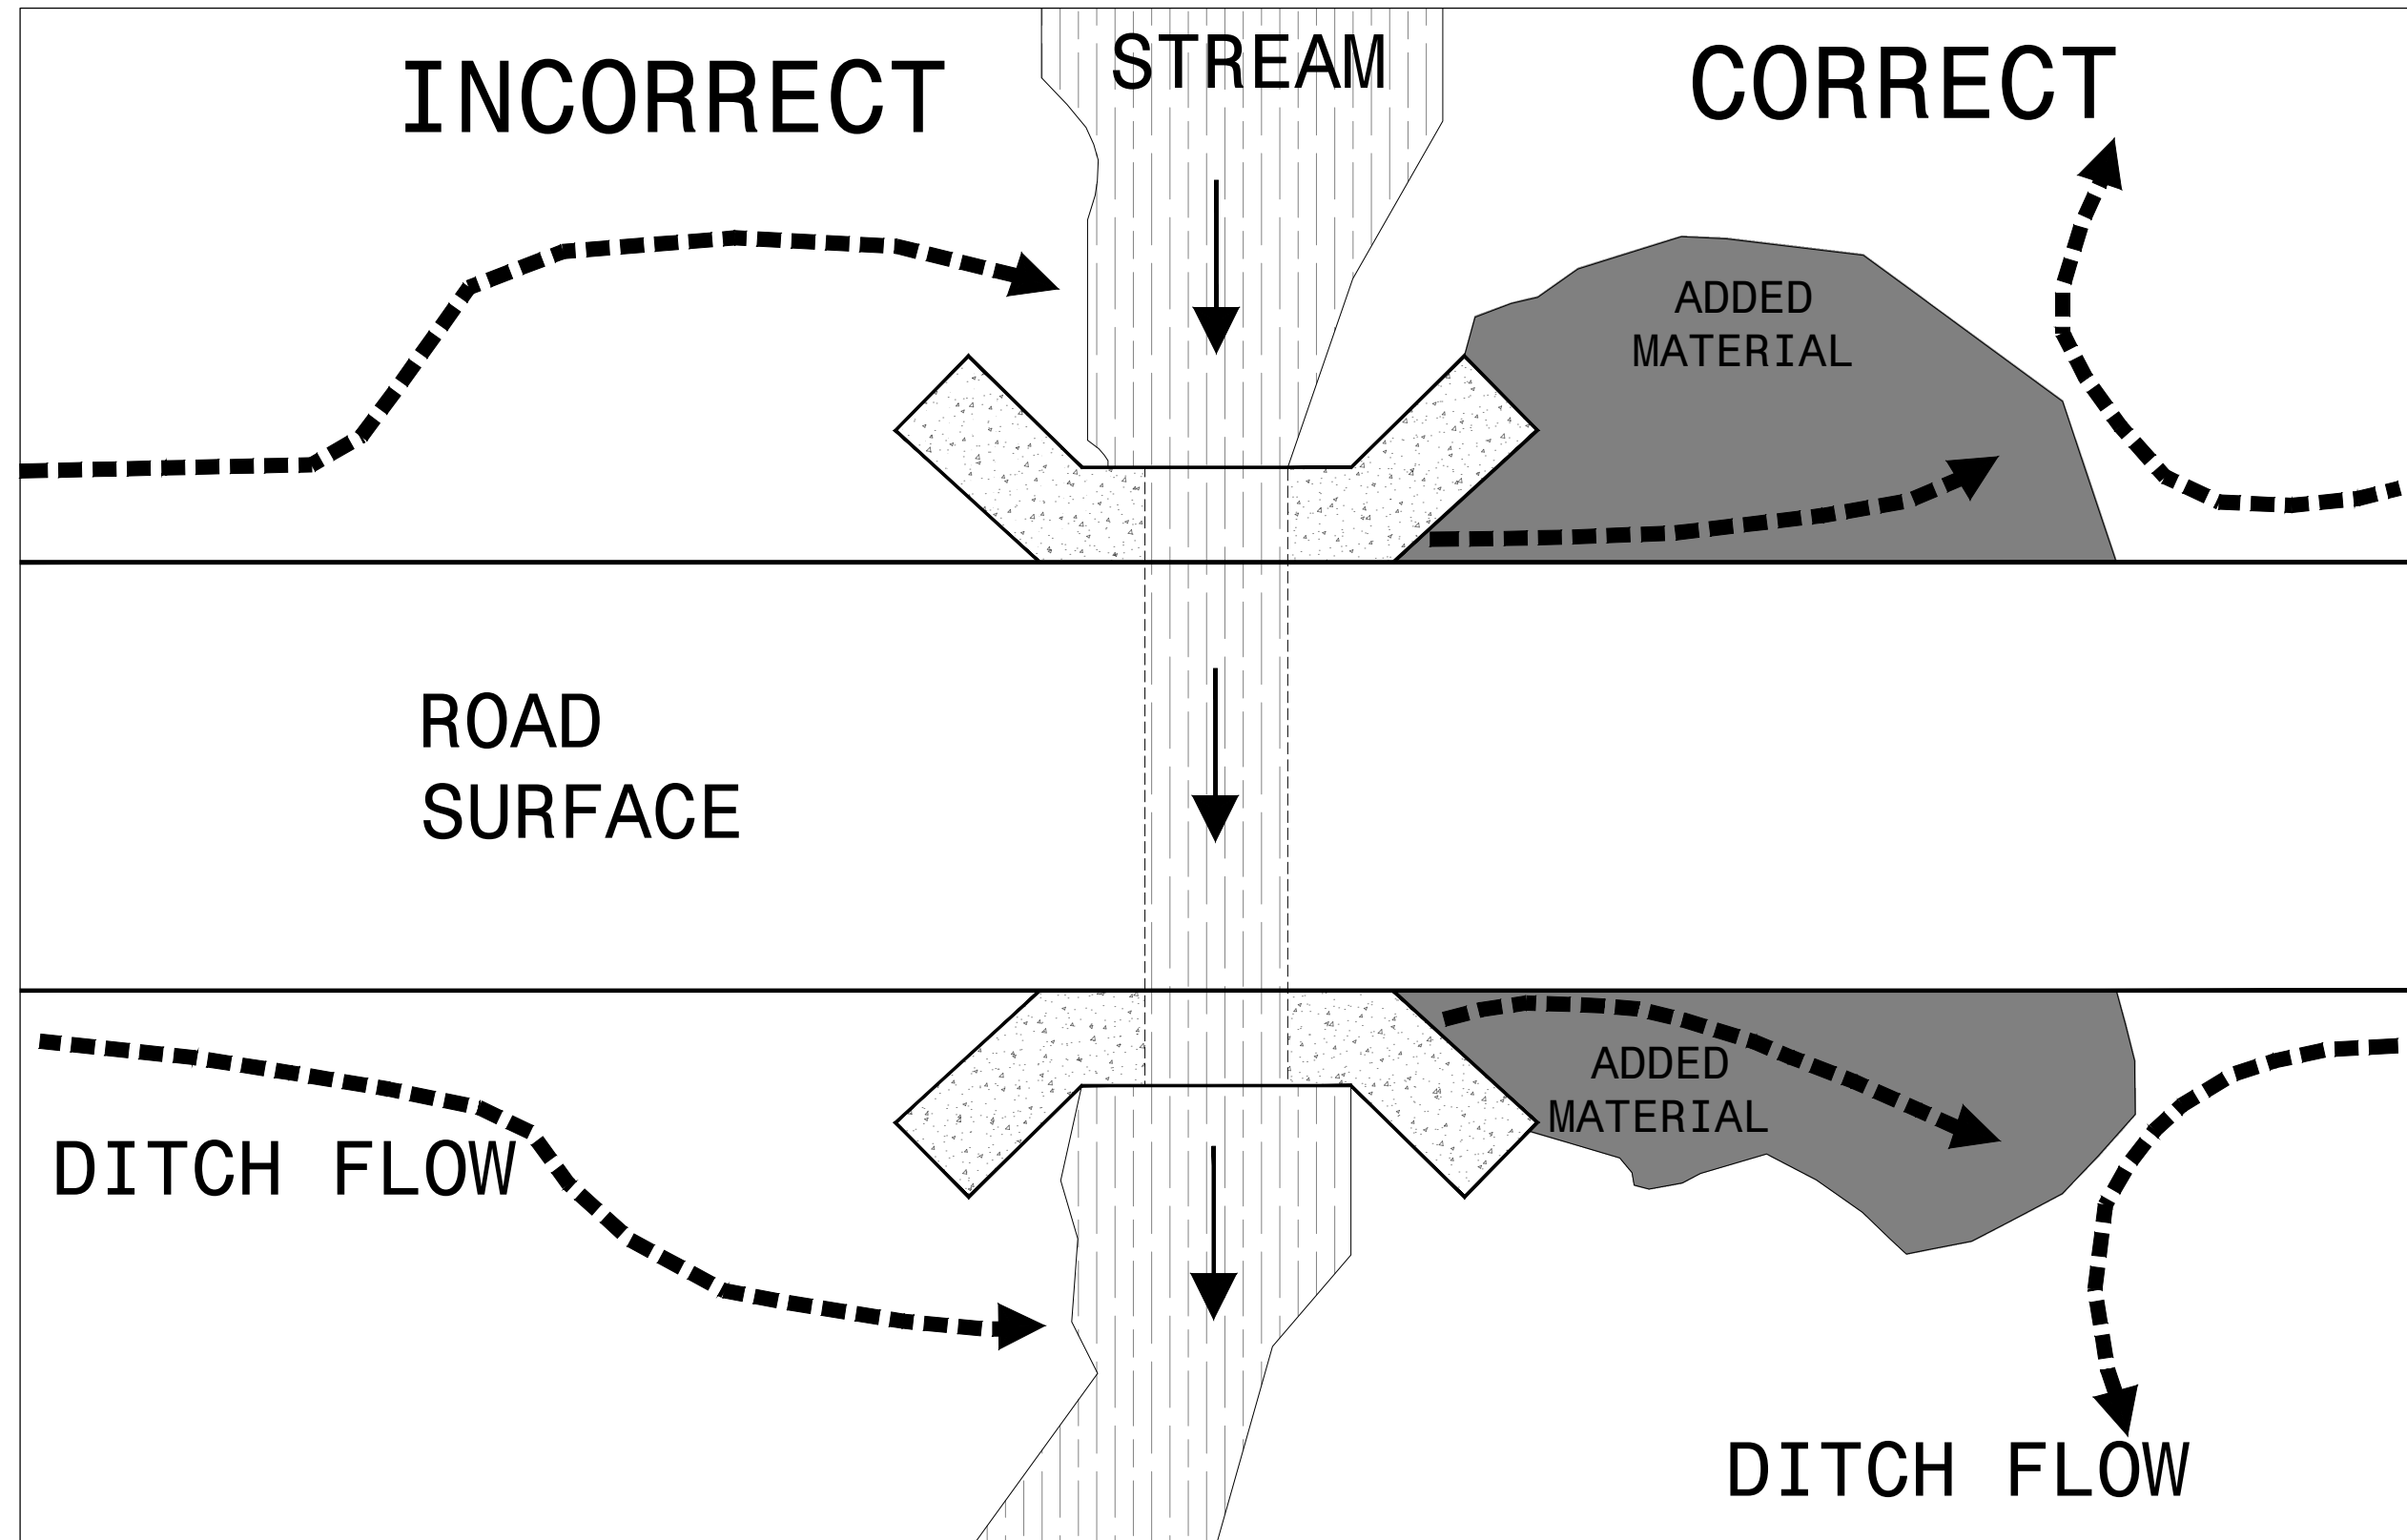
Typical Road Design for Drainage, Stability, and Safety. (From Virginia DOF)
